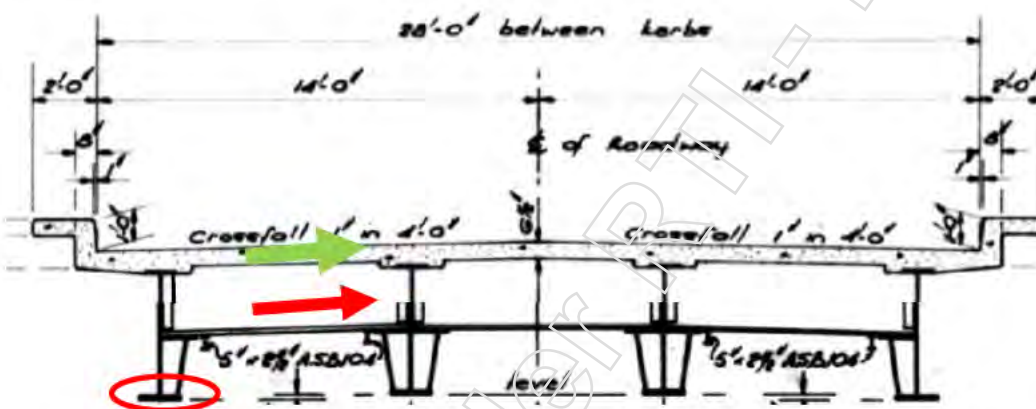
Example load distribution through internal girders and deck slab from edge girder fracture.
